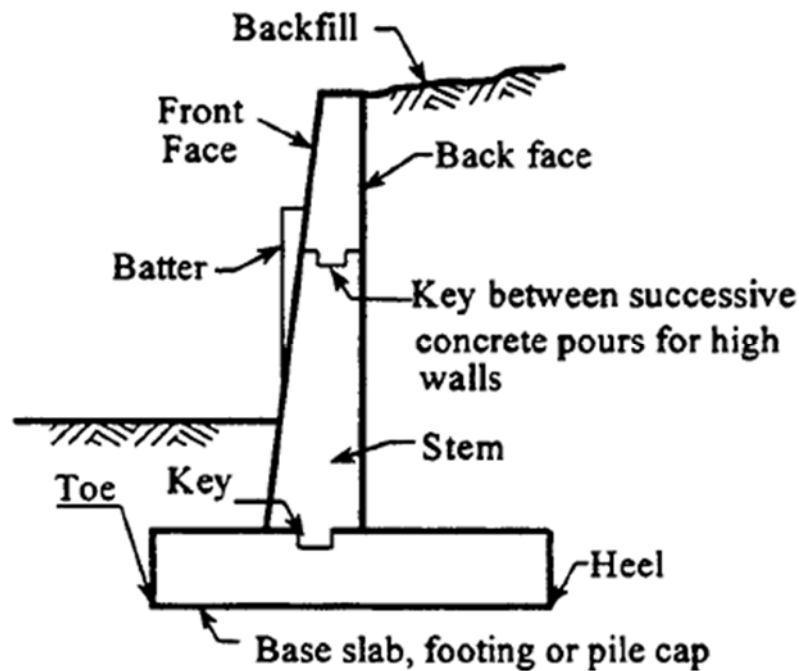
Component Parts of a Cantilever Wing Wall (FHWA, 1999)
